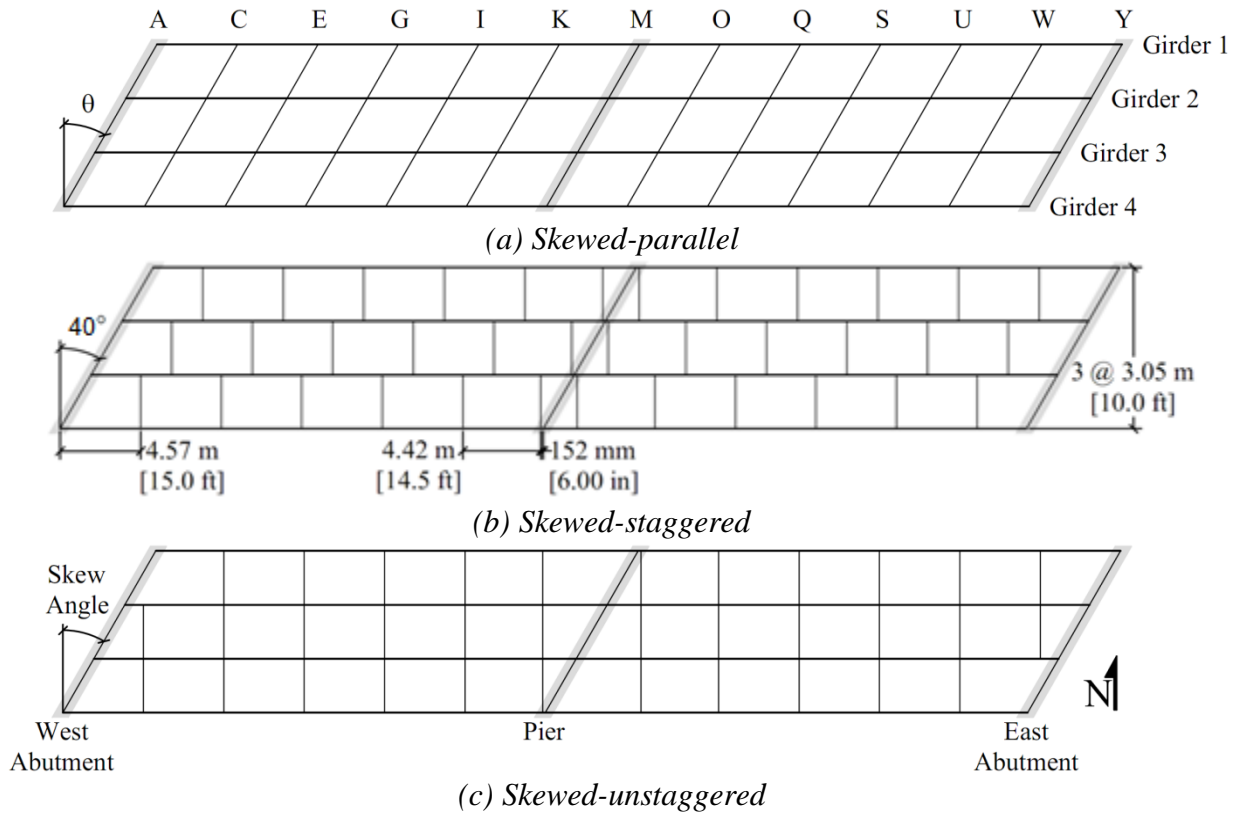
Bridge configurations (40 deg. skew with 4.57 m [15.0 ft] cross-frame spacing)
